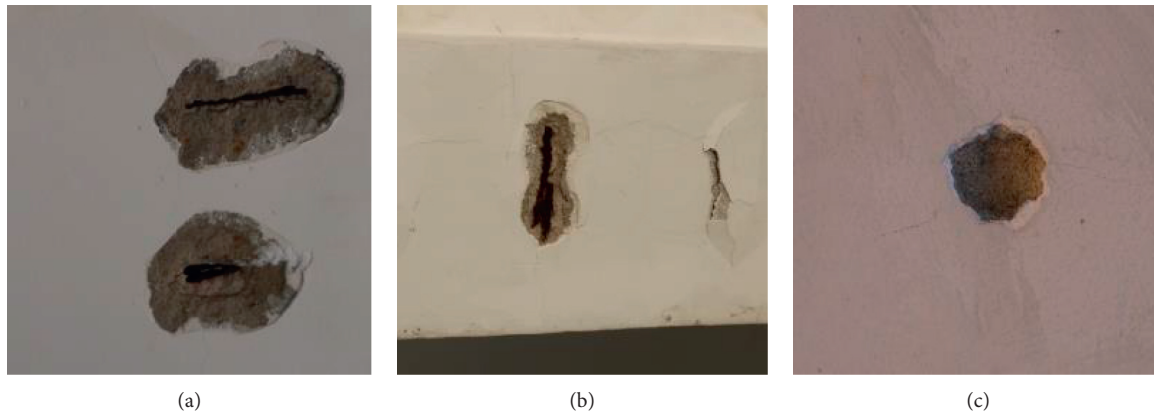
Spall objects on (a) ceiling, (b) beam, and (c) wall structures.
